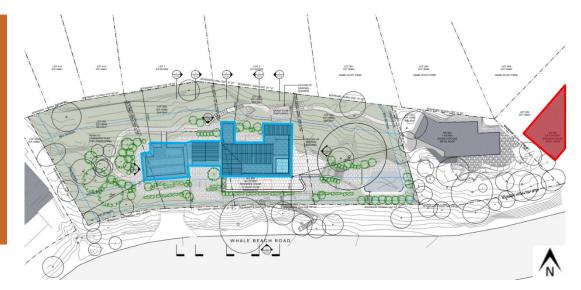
Proposed site plan with proposed new vegetation indicated in green, proposed residence indicated in blue and existing heritage item Cox House (item no. 2270014) indicated in red, Extract from Site Plan Proposed (Source: Drawing No. 0102, Rev. A)
